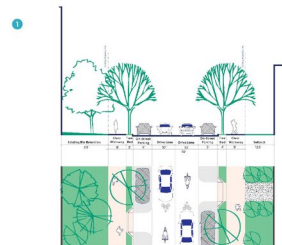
Typical Olive Avenue section between Park Boulevard and Ash Street
